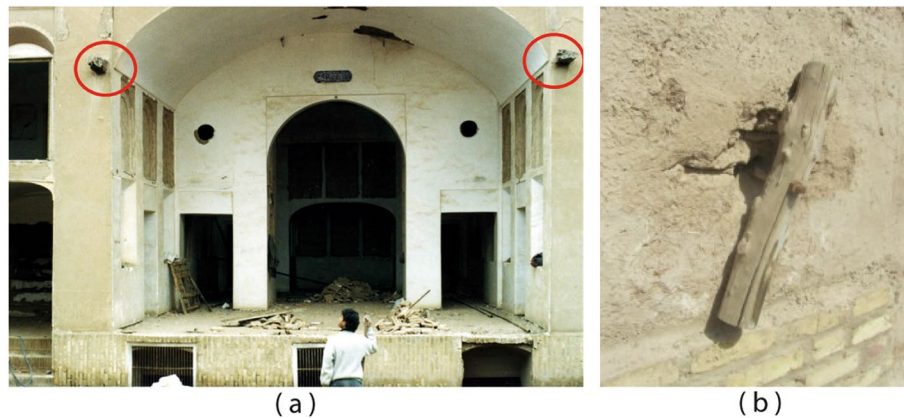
Vernacular techniques for improving the connections between structural elements with (a) timber beams at the vault impost, Zargar house, Yazd (Source: the authors) and (b) wooden ties (Source: Asgharian Jedi and Owlia 2013)
